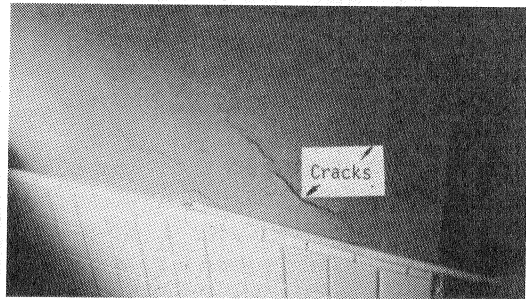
Crack occurred in mud of house at Nakayama(place B).
